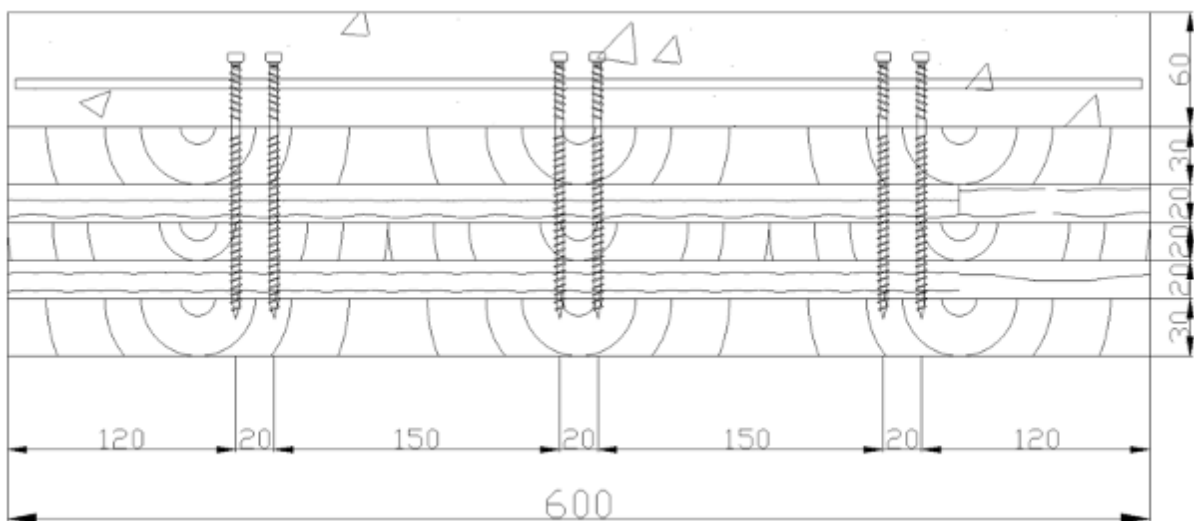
Cross section of CLT-concrete composite with CTC screws and reinforcement [mm]
